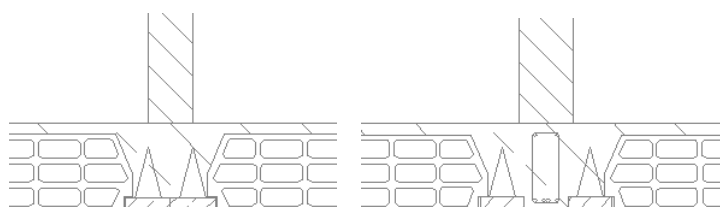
Solution of support of partition wall situated along ceiling beams
